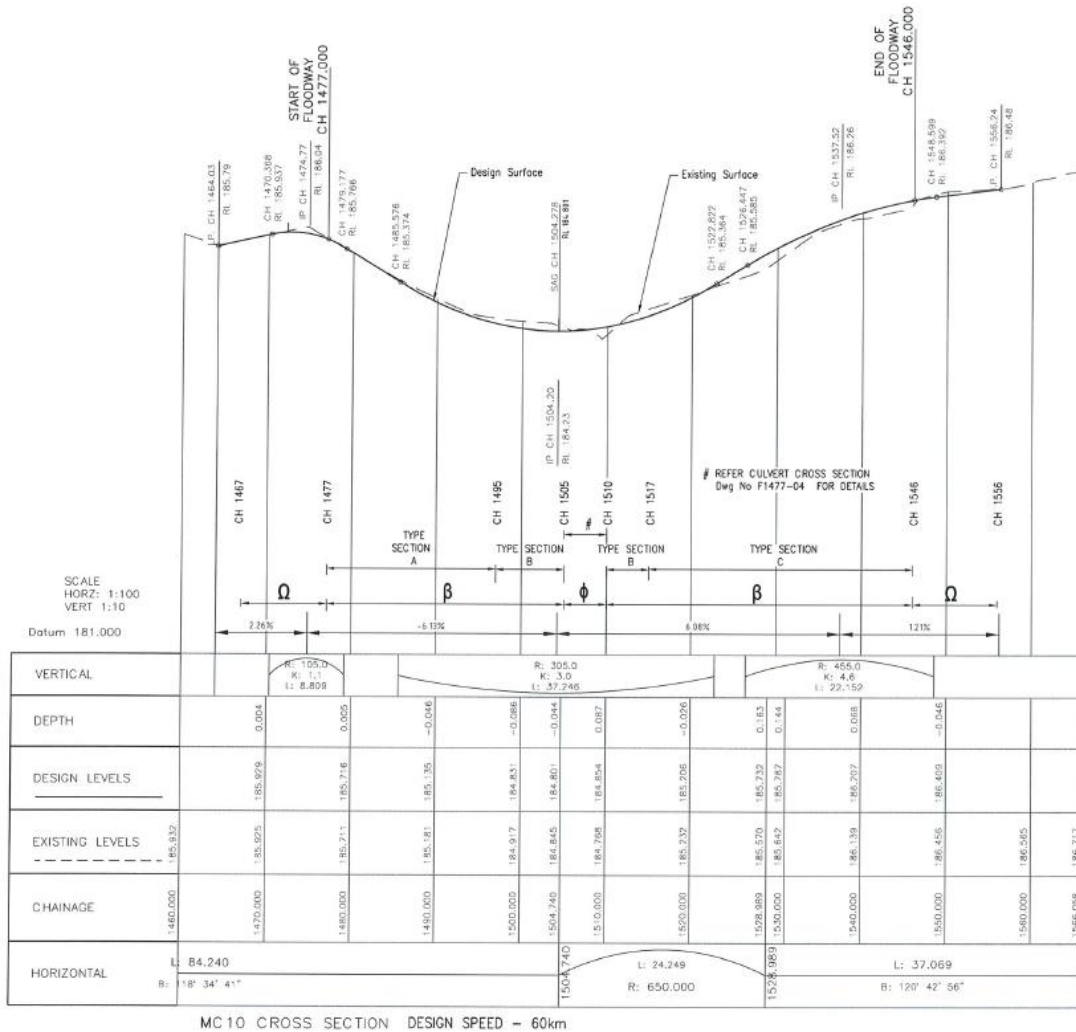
LHBR Side View of Tenthill Creek Elevation
